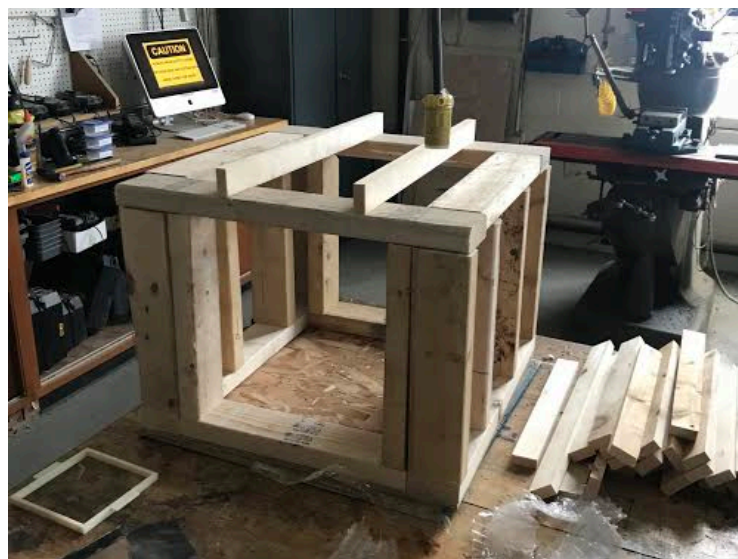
shows the 24 x 24-inch base and 18-inch tall wall studs.
